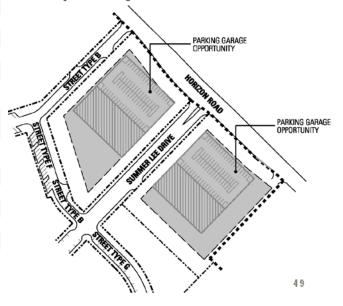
':Horizon/Summer Lee Sub-District
